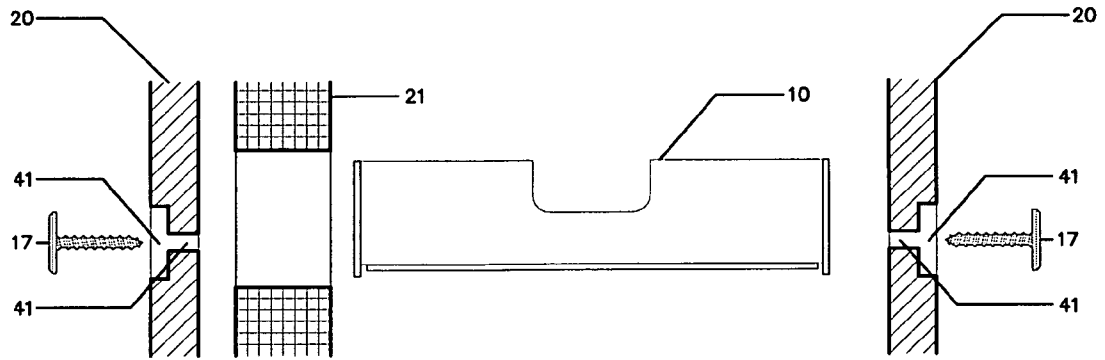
A EXPLODE PANEL ASSEMBLY DETAILS
